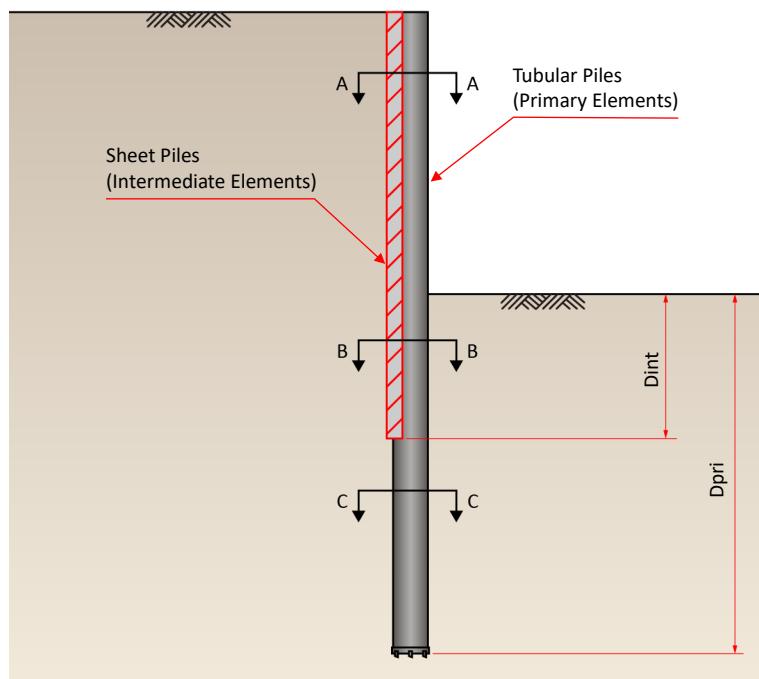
(a). Combi-Gyro Wall - Section (Pattern A)
